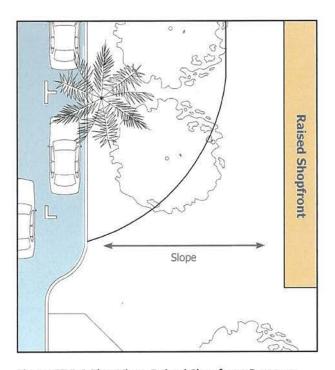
Plan View, Raised Shopfront Frontage (Illustrative; canopy roof not shown)
